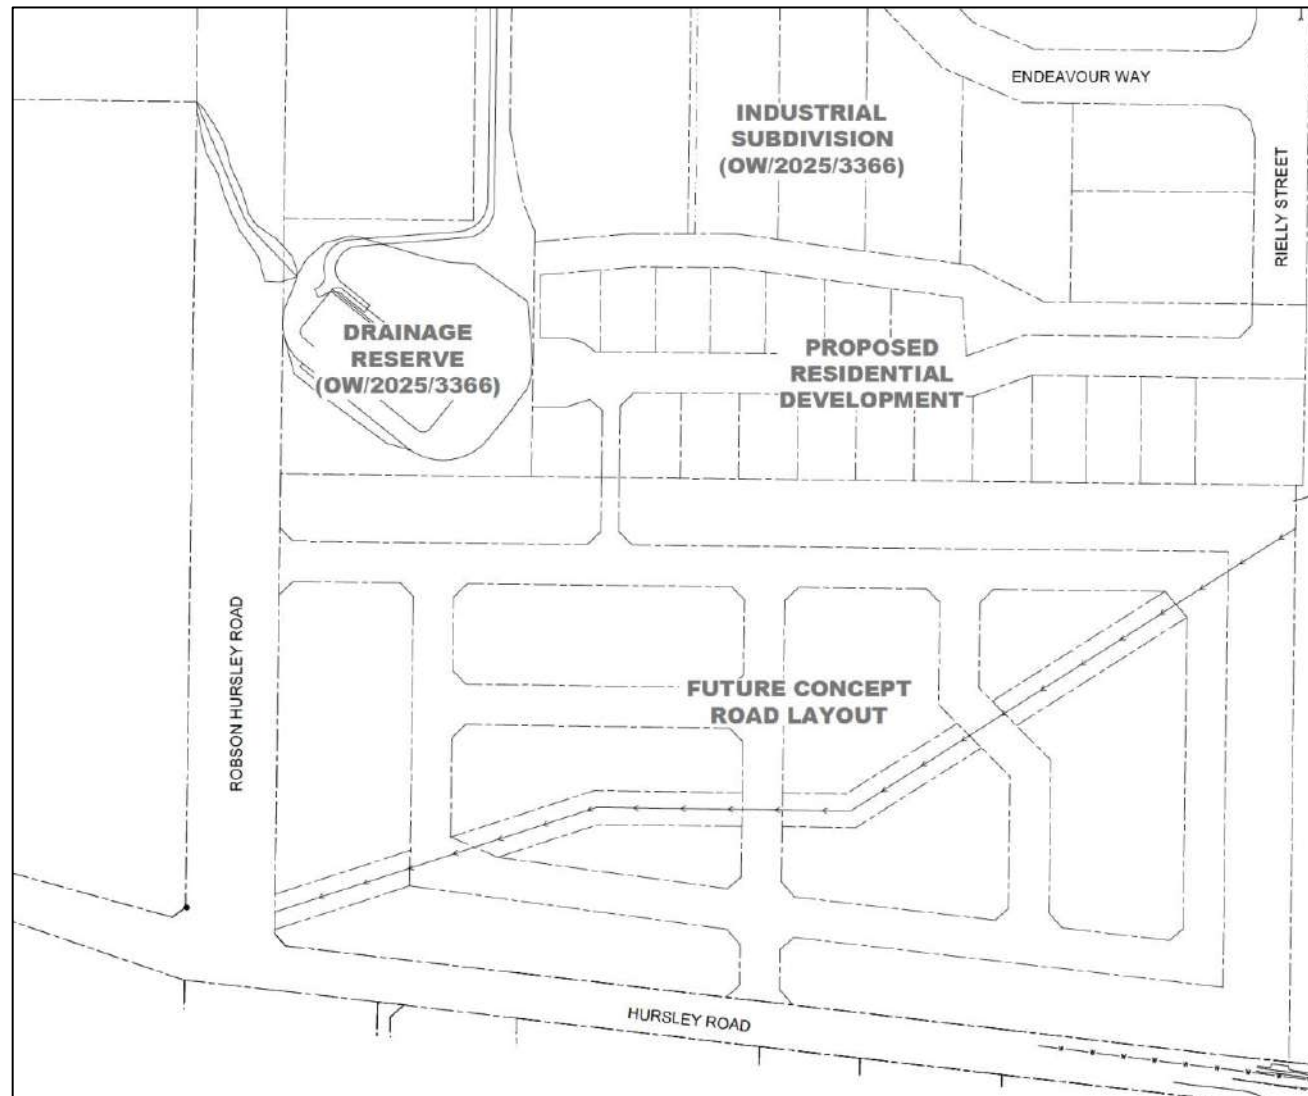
PROPOSED CONCEPT MASTER PLAN
